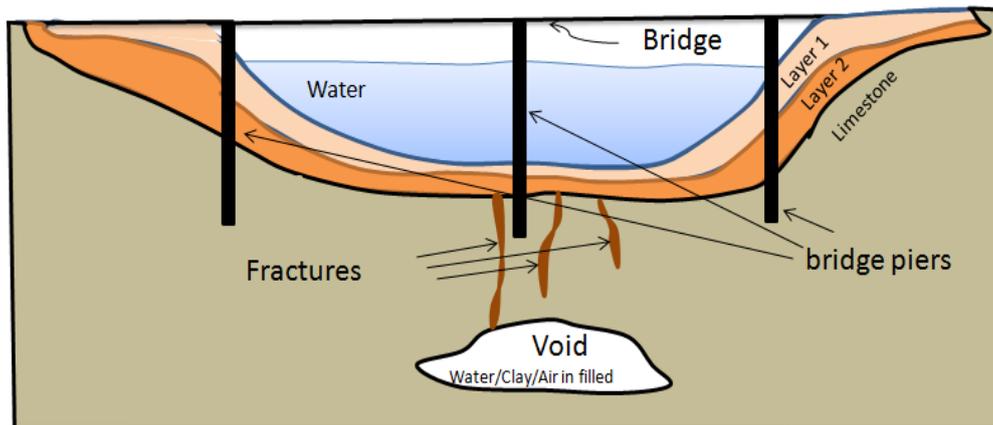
A sketch of bedrock fractures that may make the bridge piers unstable.
